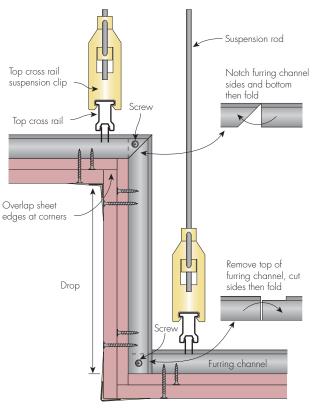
Suspended Ceiling Bulkhead -Elevation
